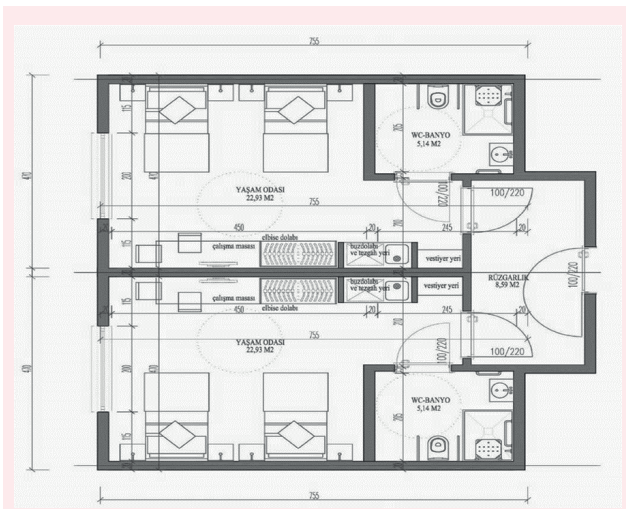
Prefabricated House Plan (Akyıldız et al., 2018)
